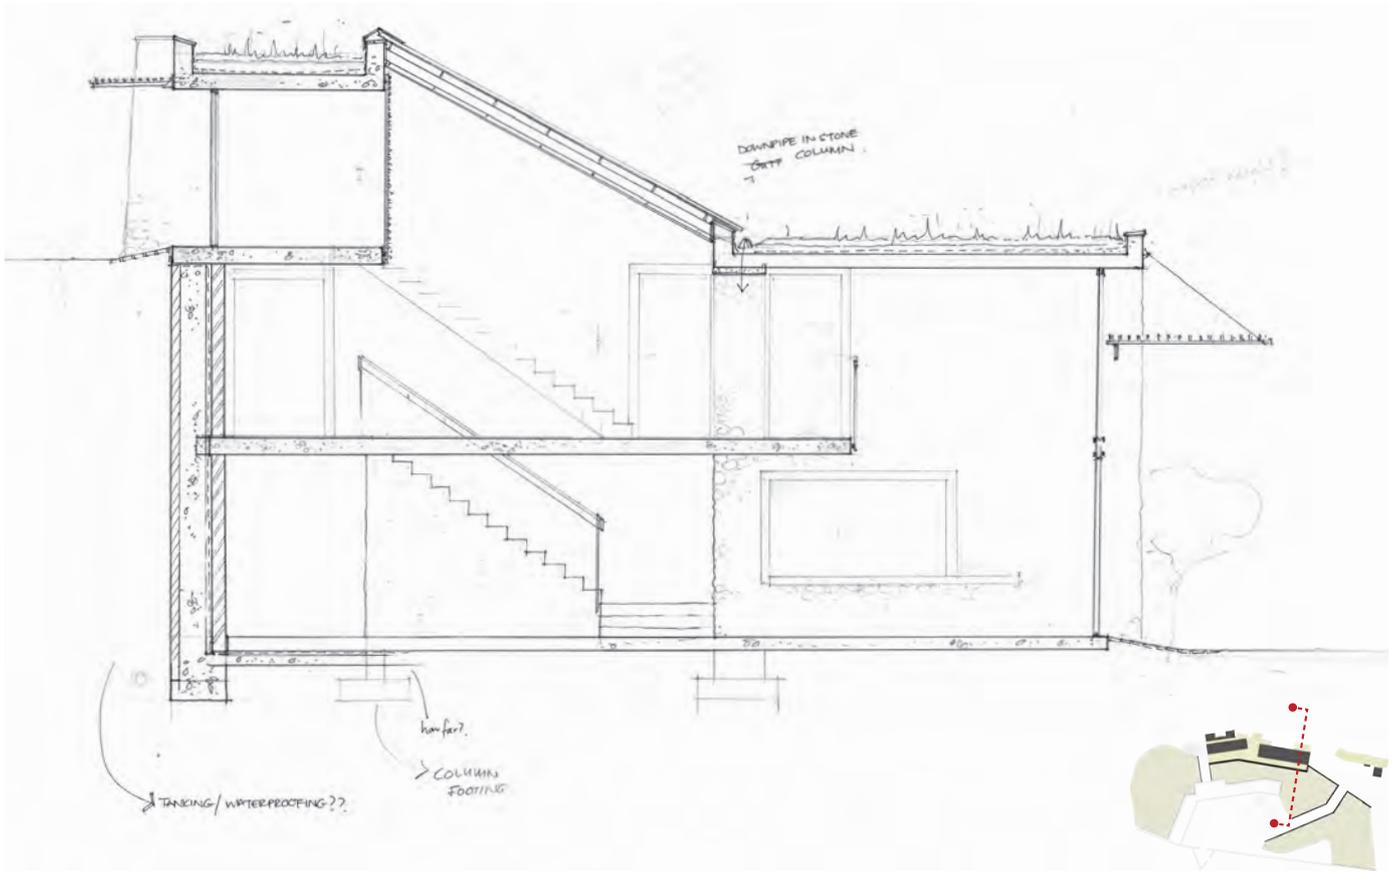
Section through the Waiting area and Circulation core, SCALE 1:100 (Author 2017)
